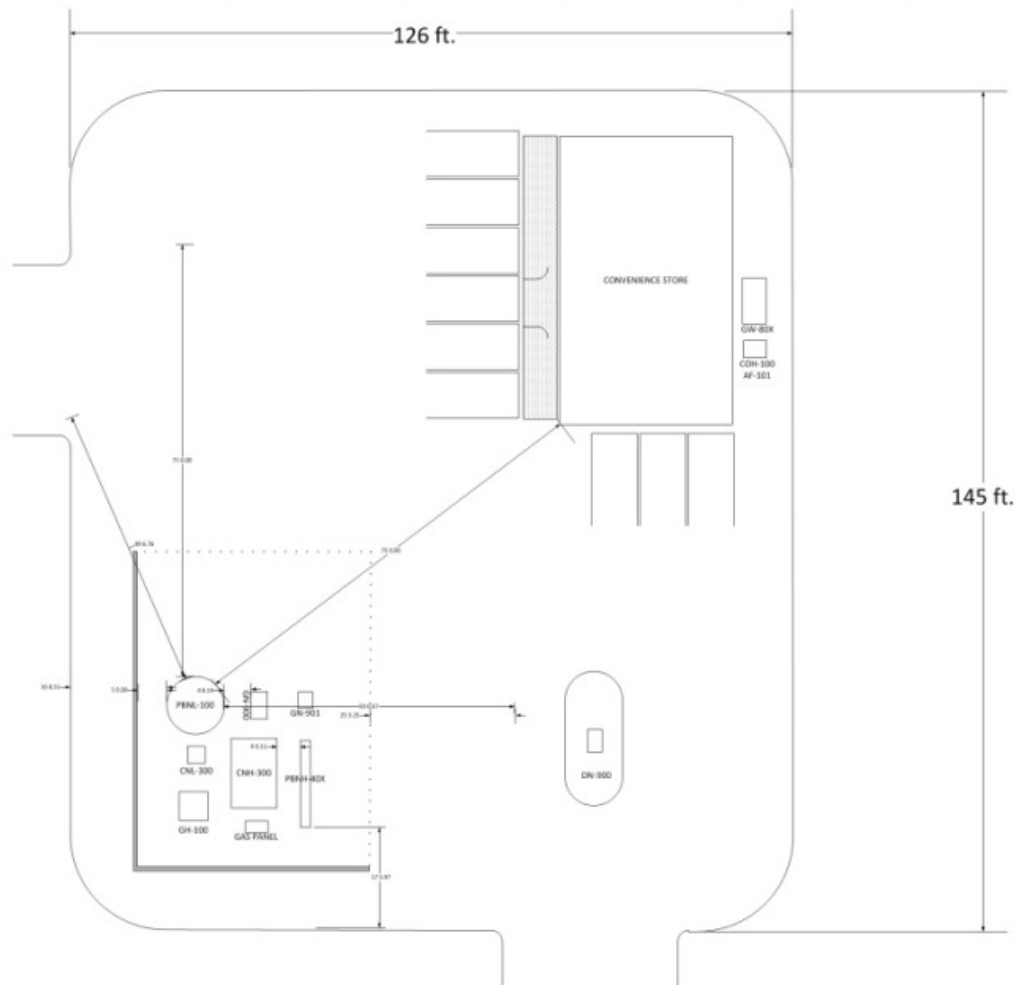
Layout of liquid hydrogen station on greenfield site with dimensions
